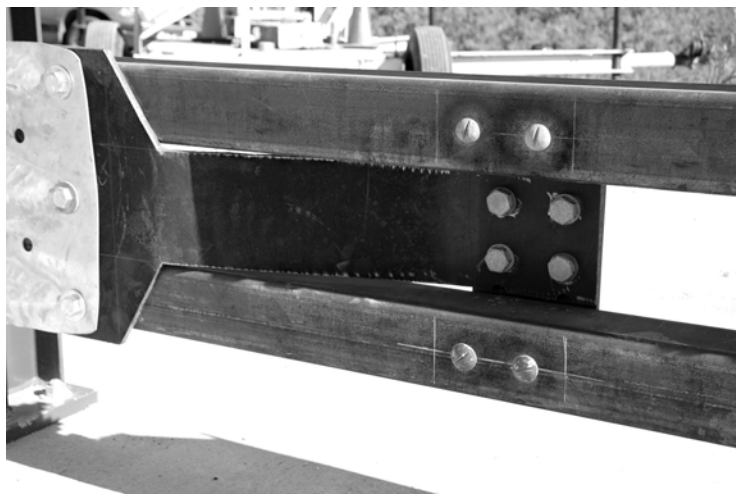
Details of thrie beam transition connection to bridge rail—thrie beam connection to tubular railing.
